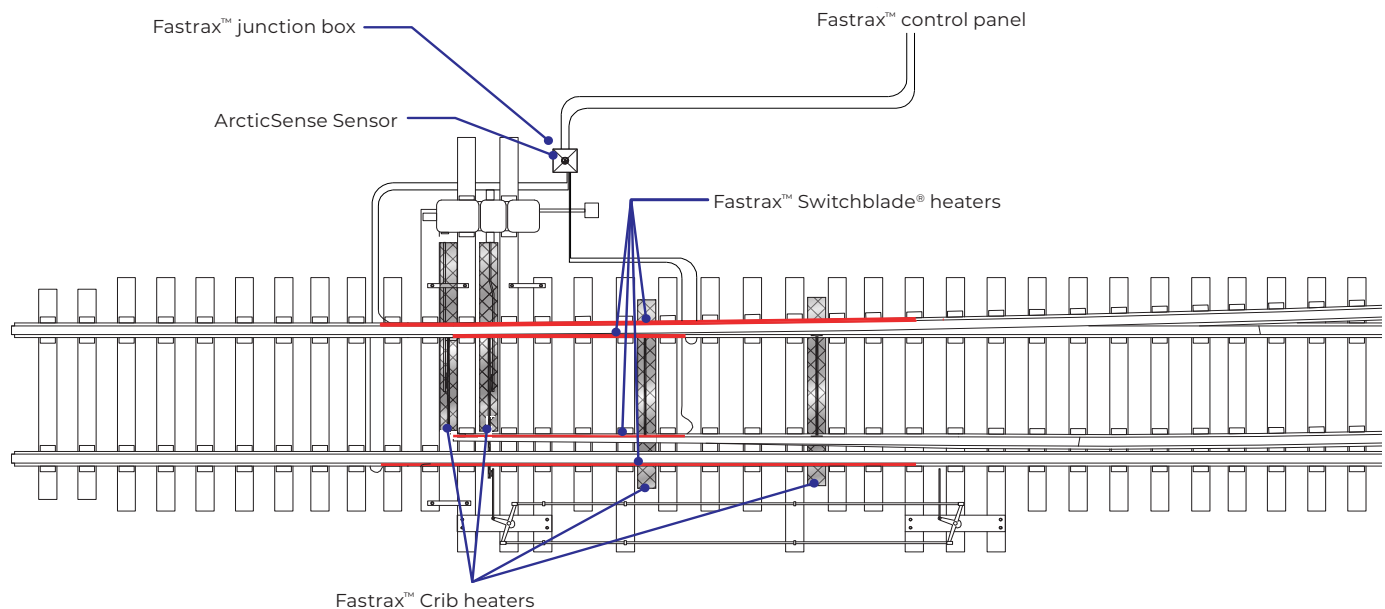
Typical Running/Stock Rail Heating Layout - Equipment Detail, No. 14, 15 or 16 Standard Switch Size (All Tie Styles)
